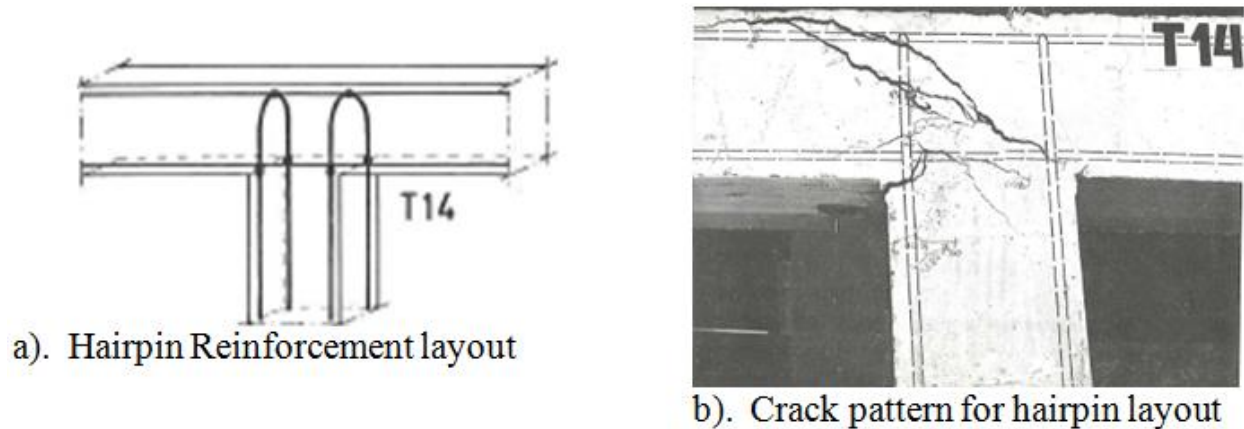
Hairpin reinforcement layout for T-joints (Nilsson, 1973)
